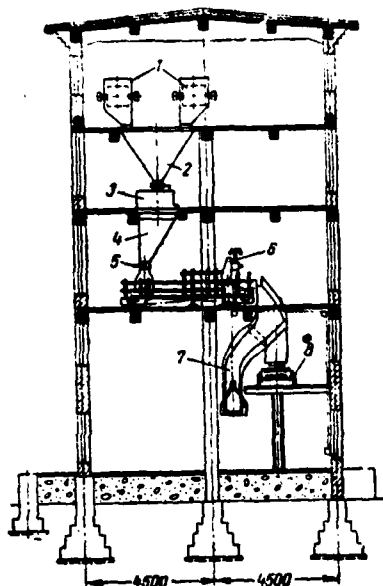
Plan for Arrangement of Equipment in Ammonium Nitrate Packing Section
